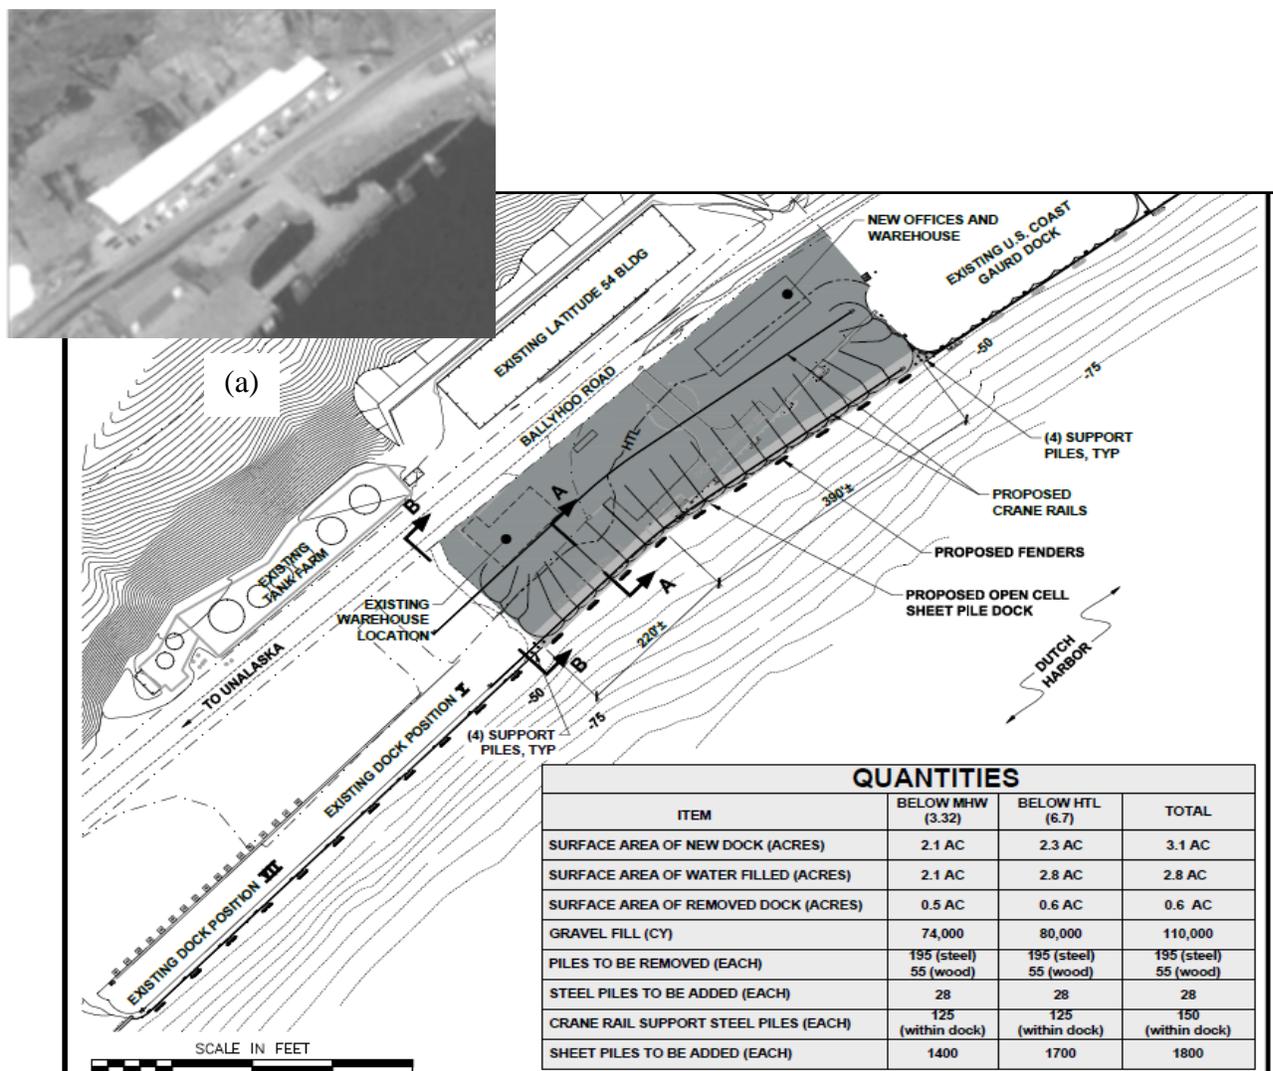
(a) – Existing and proposed UMC Dock facilities, Dutch Harbor, Alaska. Dark gray indicates area to be filled. Positions of sheet piles, fenders, and crane rail and support piles are indicated. Inset: photograph showing current dock, with narrow offloading area.
